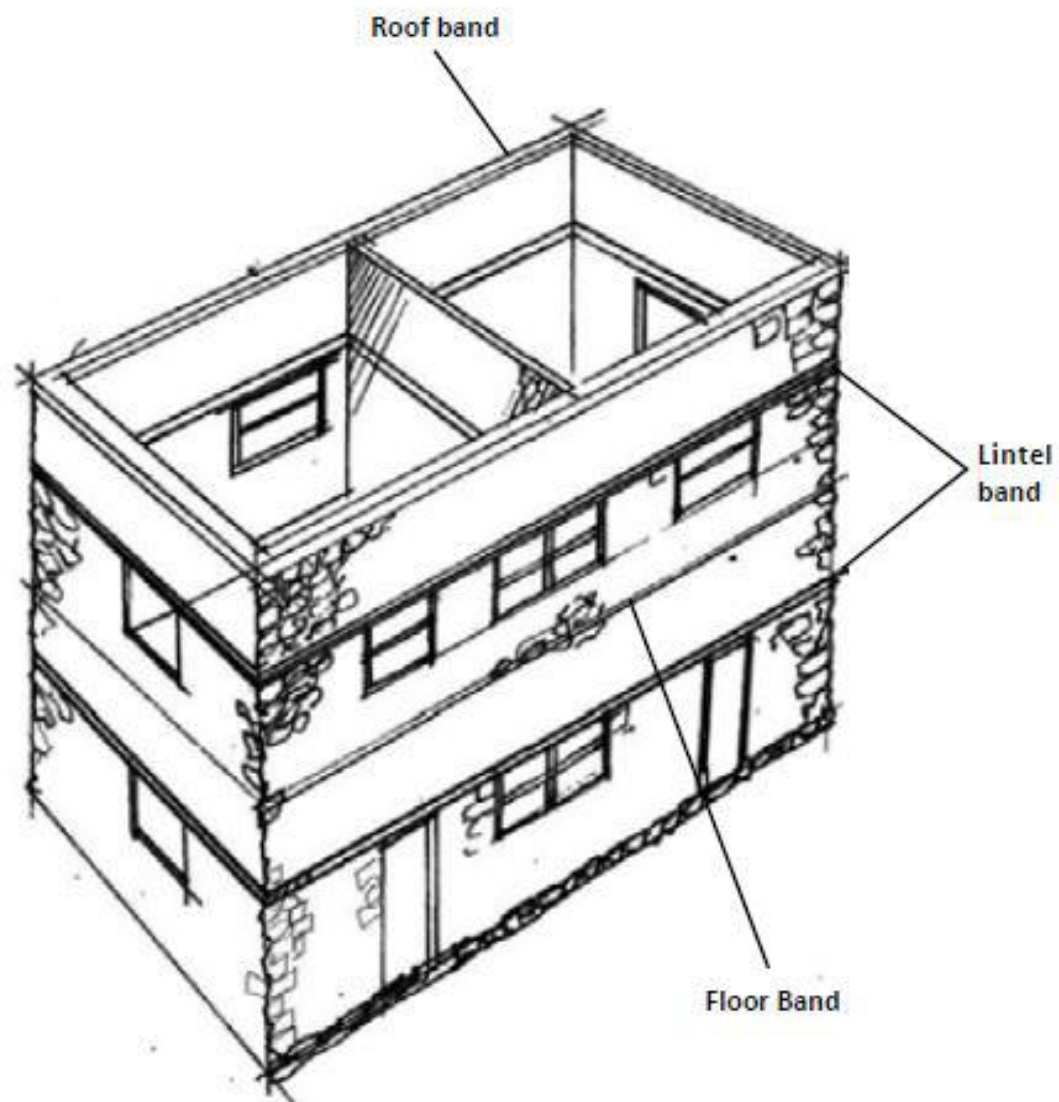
Locations of seismic bands in a stone masonry building (roof omitted for clarity) (adapted from: UNCRD 2003)
